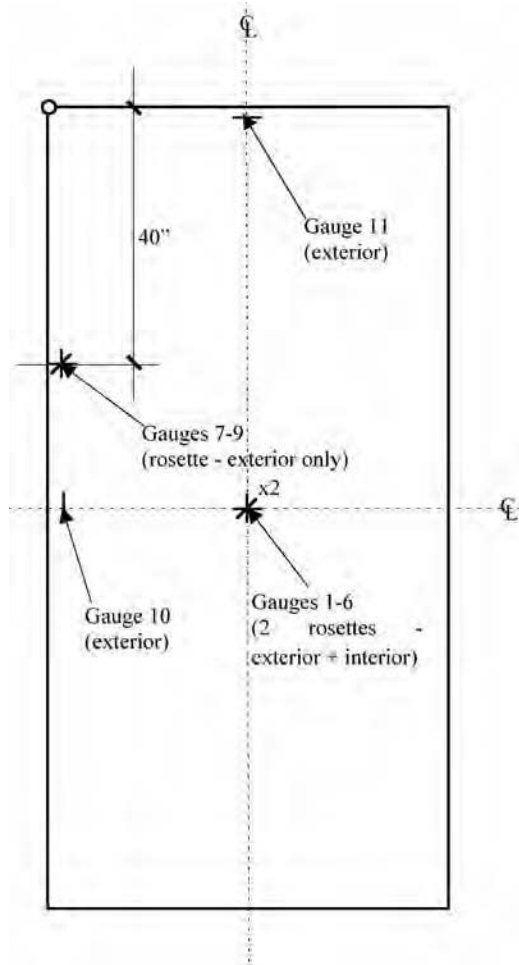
Full-scale test assembly 1 gauge location schematic.
